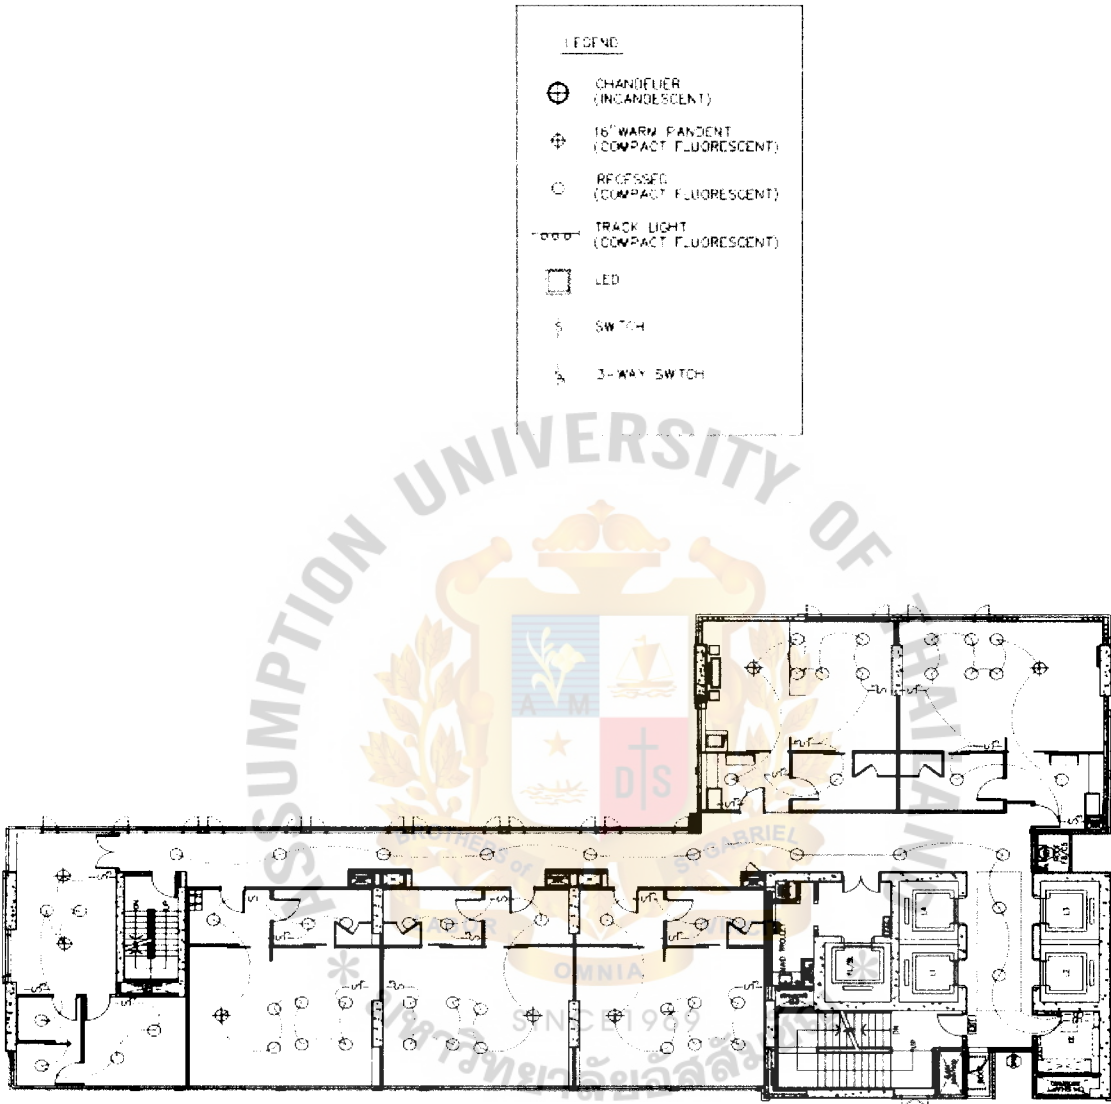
Reflected Ceiling and Lighting Plan of 29th-30th floor plan
